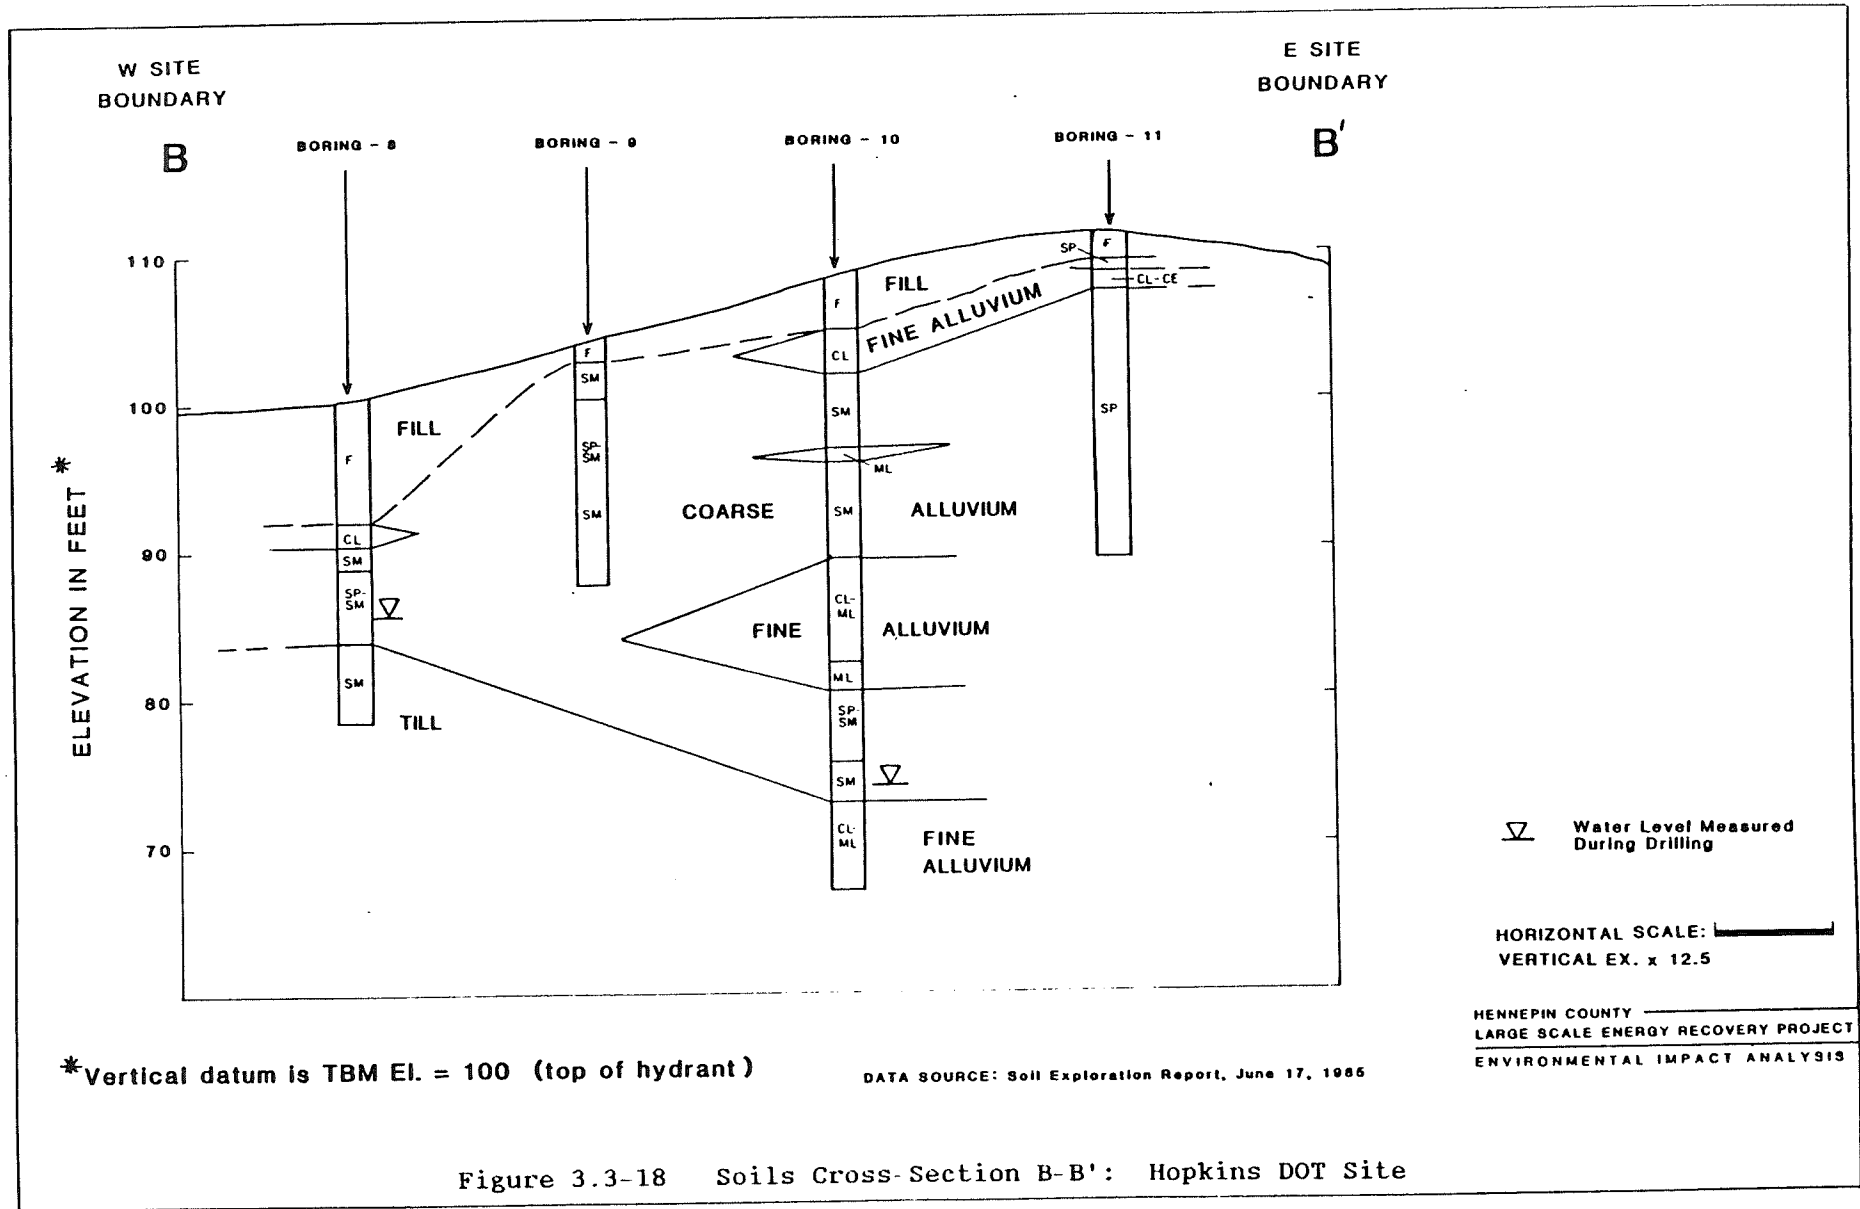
Soils Cross-Section B-B': Hopkins DOT Site
